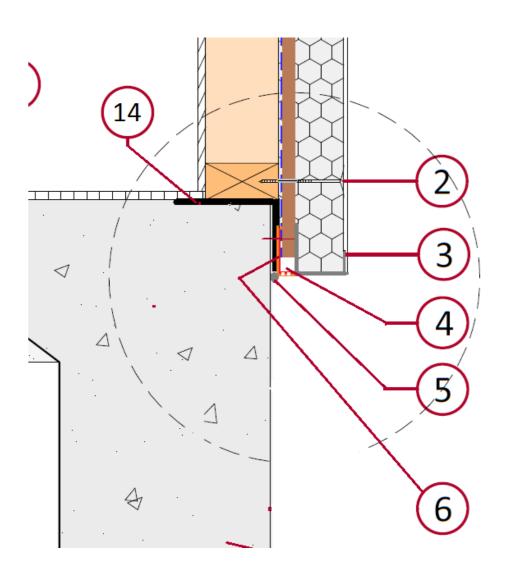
A- PANEL TO MASONARY DETAILS - SECTION VIEW - Direct Fix System
